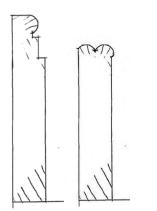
Profile of primary base (left) in room 103, and secondary base along the stair wall.
